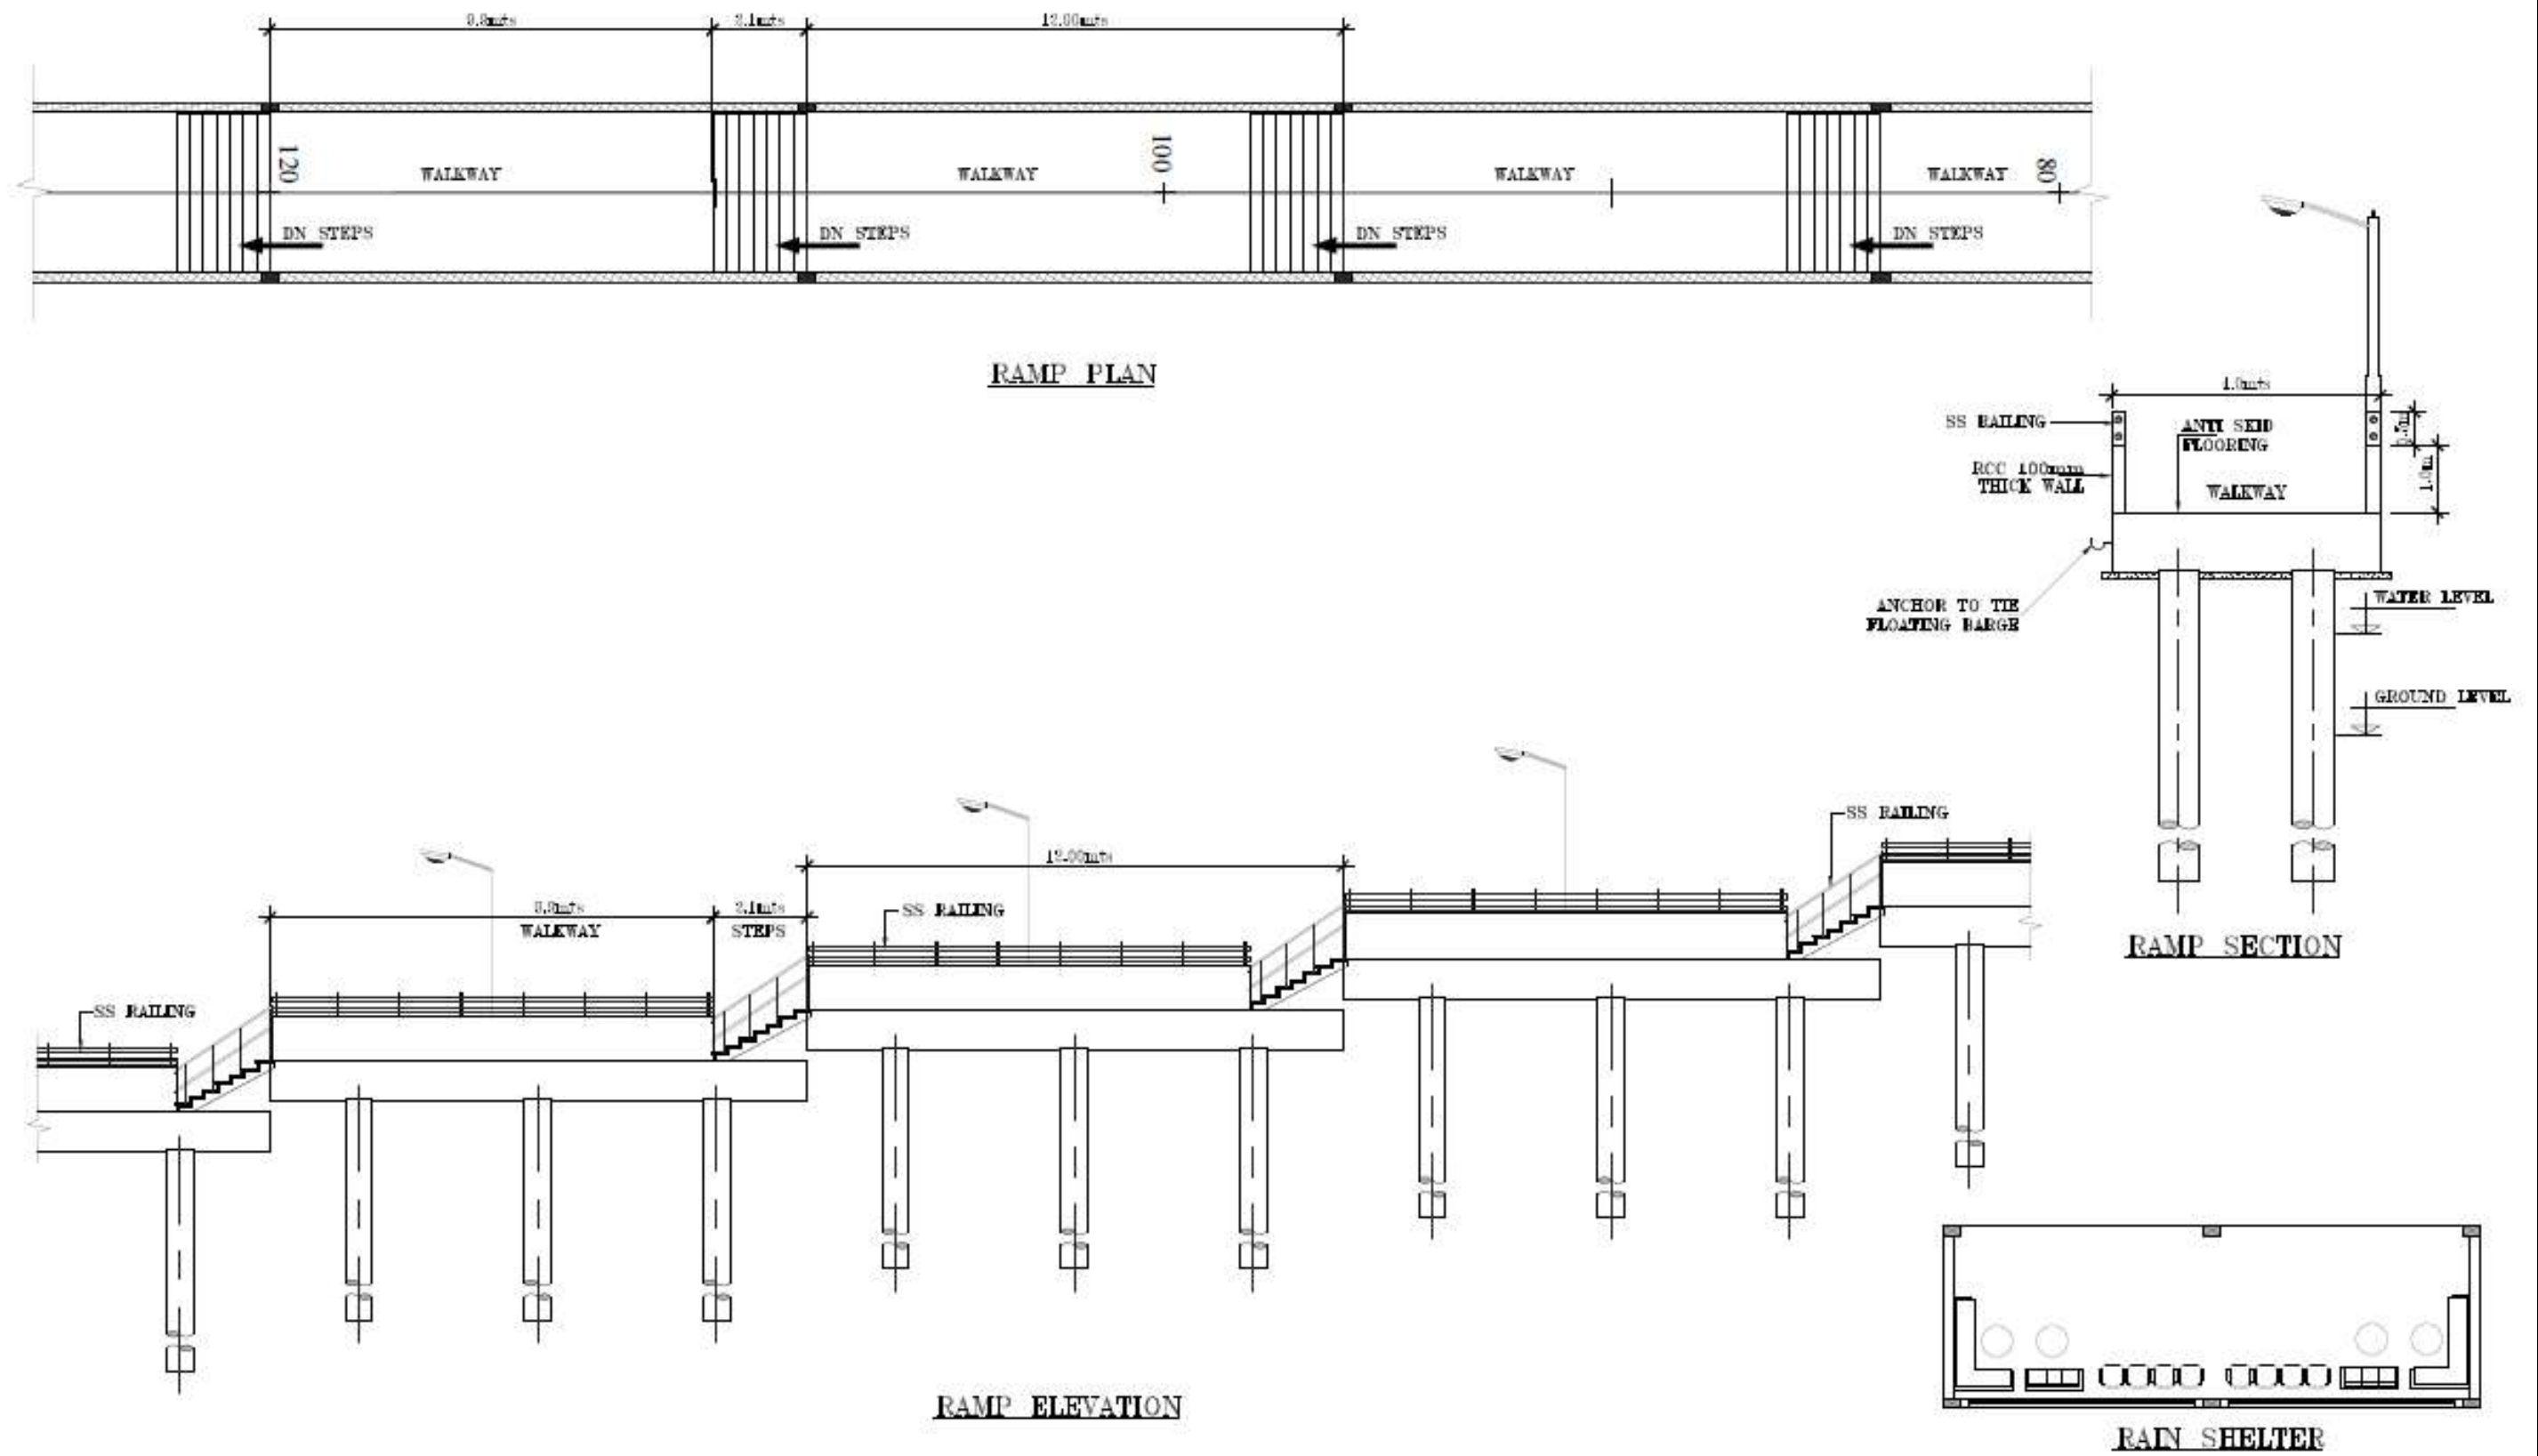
General Arrangement and Sectional Elevation of Jetty Facility near Luhnu Stadium Bilaspur
